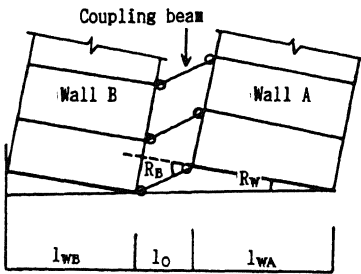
Schematic relation for deformation compatibility between shear walls and coupling beam.
